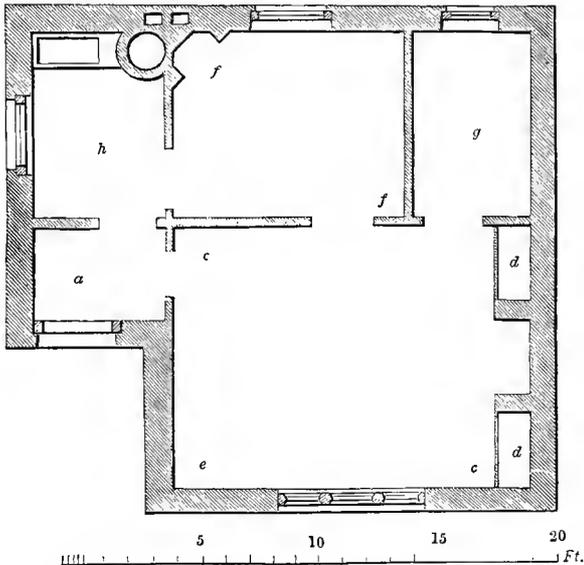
Ground-plan of single-storeyed detached cottage.
